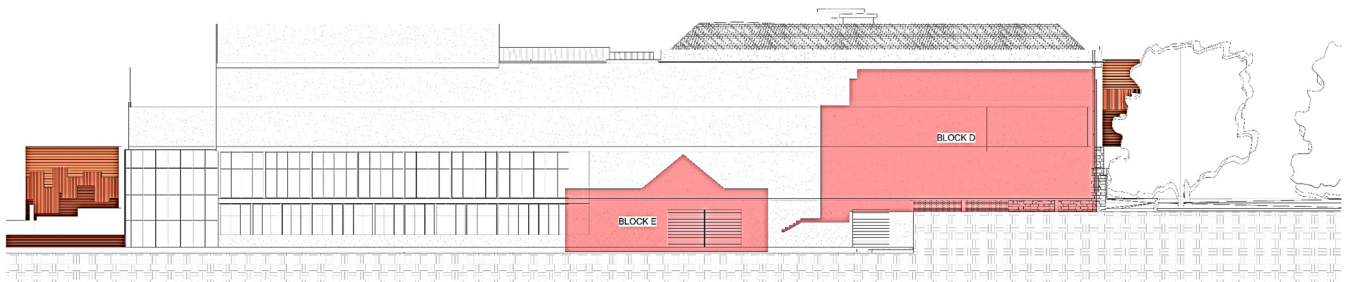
NORTH ELEVATION: Footprint of Block E & D in existing position.
